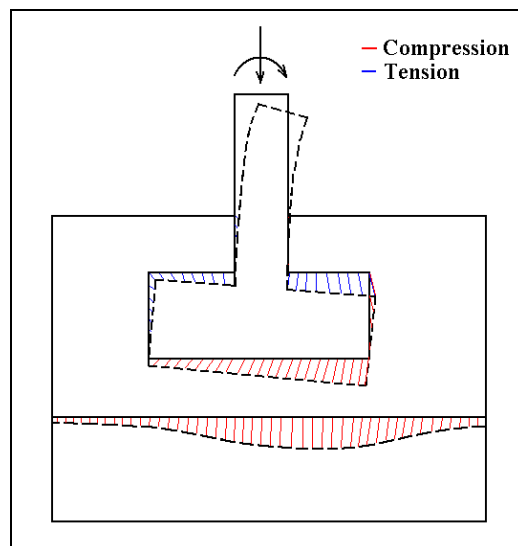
The deformation pattern of a column-foundation structure under typical loading.
